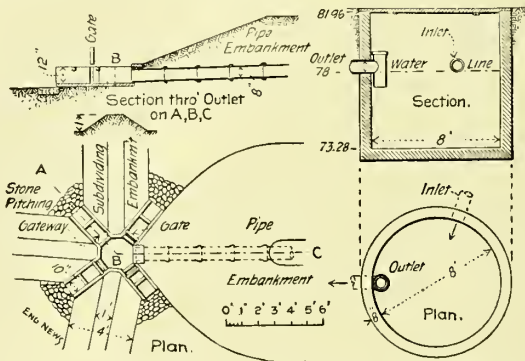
PLAN AND SECTION THROUGH SEWAGE OUTLETS AND CESSPOOL.
